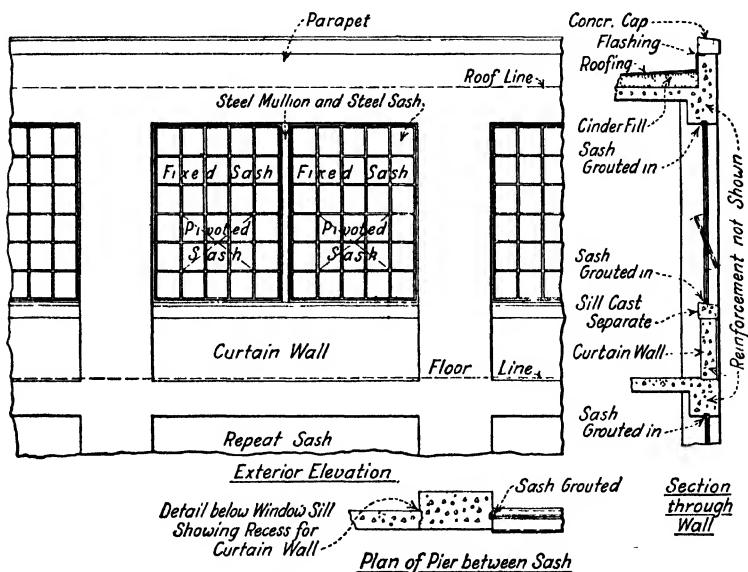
Details of Concrete Exterior. (See p. 729.)
